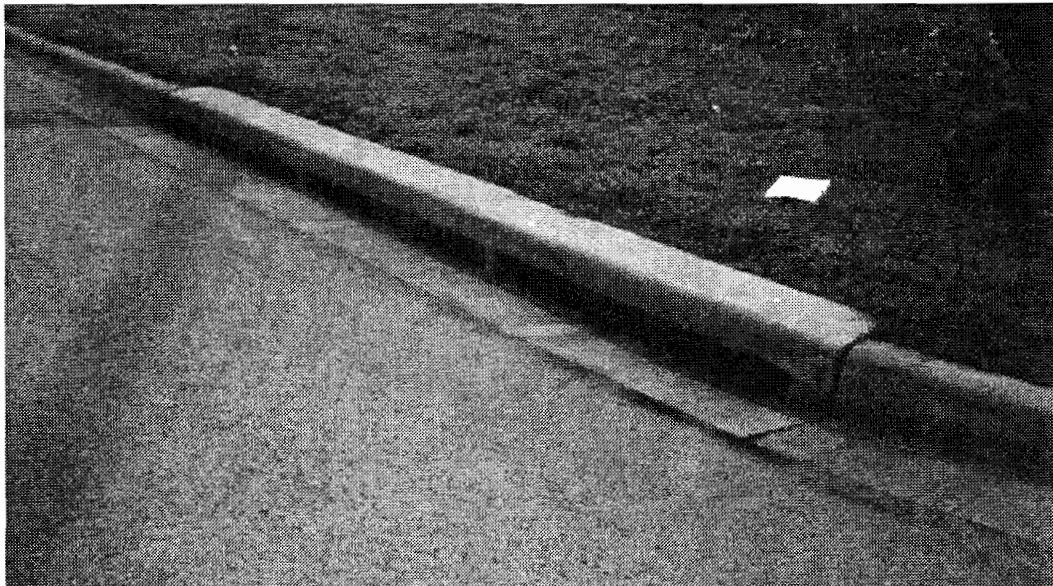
Field Installation of 15-ft Type D Curb Inlet
